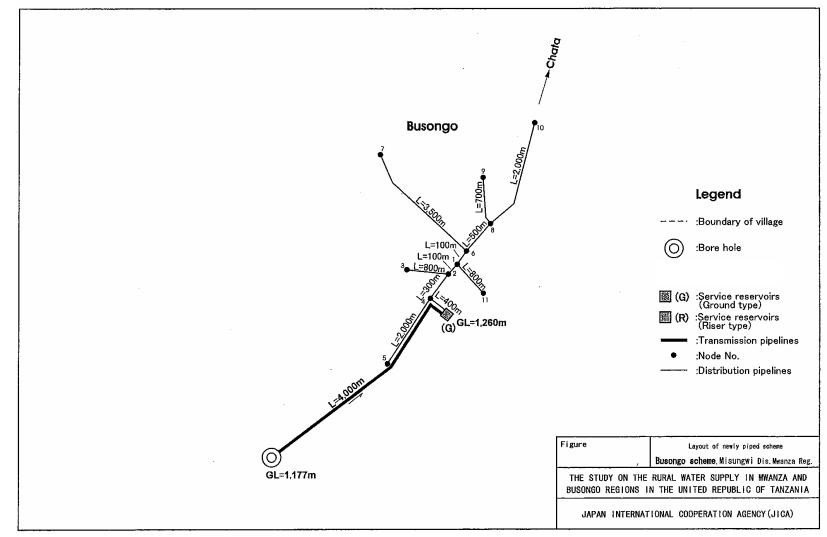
Layout of Newly Installed Piped Scheme (Busongo Scheme)
